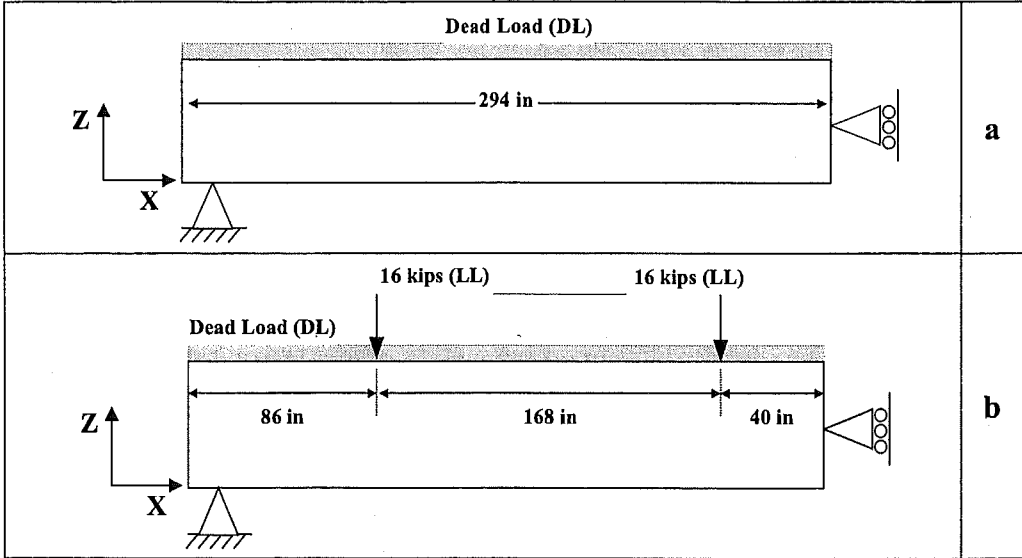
a) Beam FE Model and Loading under Dead Load; b) Live Load Distribution on the Girder
